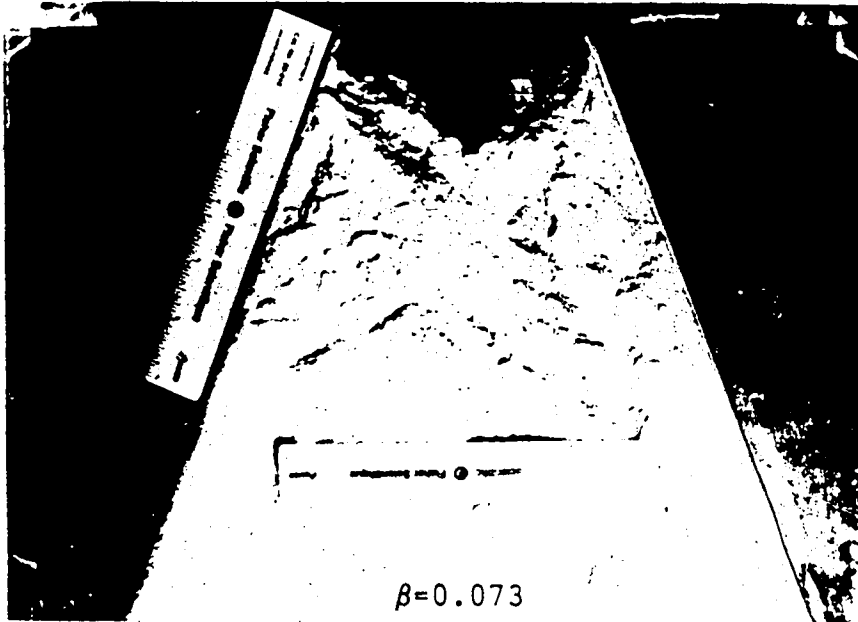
Failure Around Openings with Minimum Reinforcement
